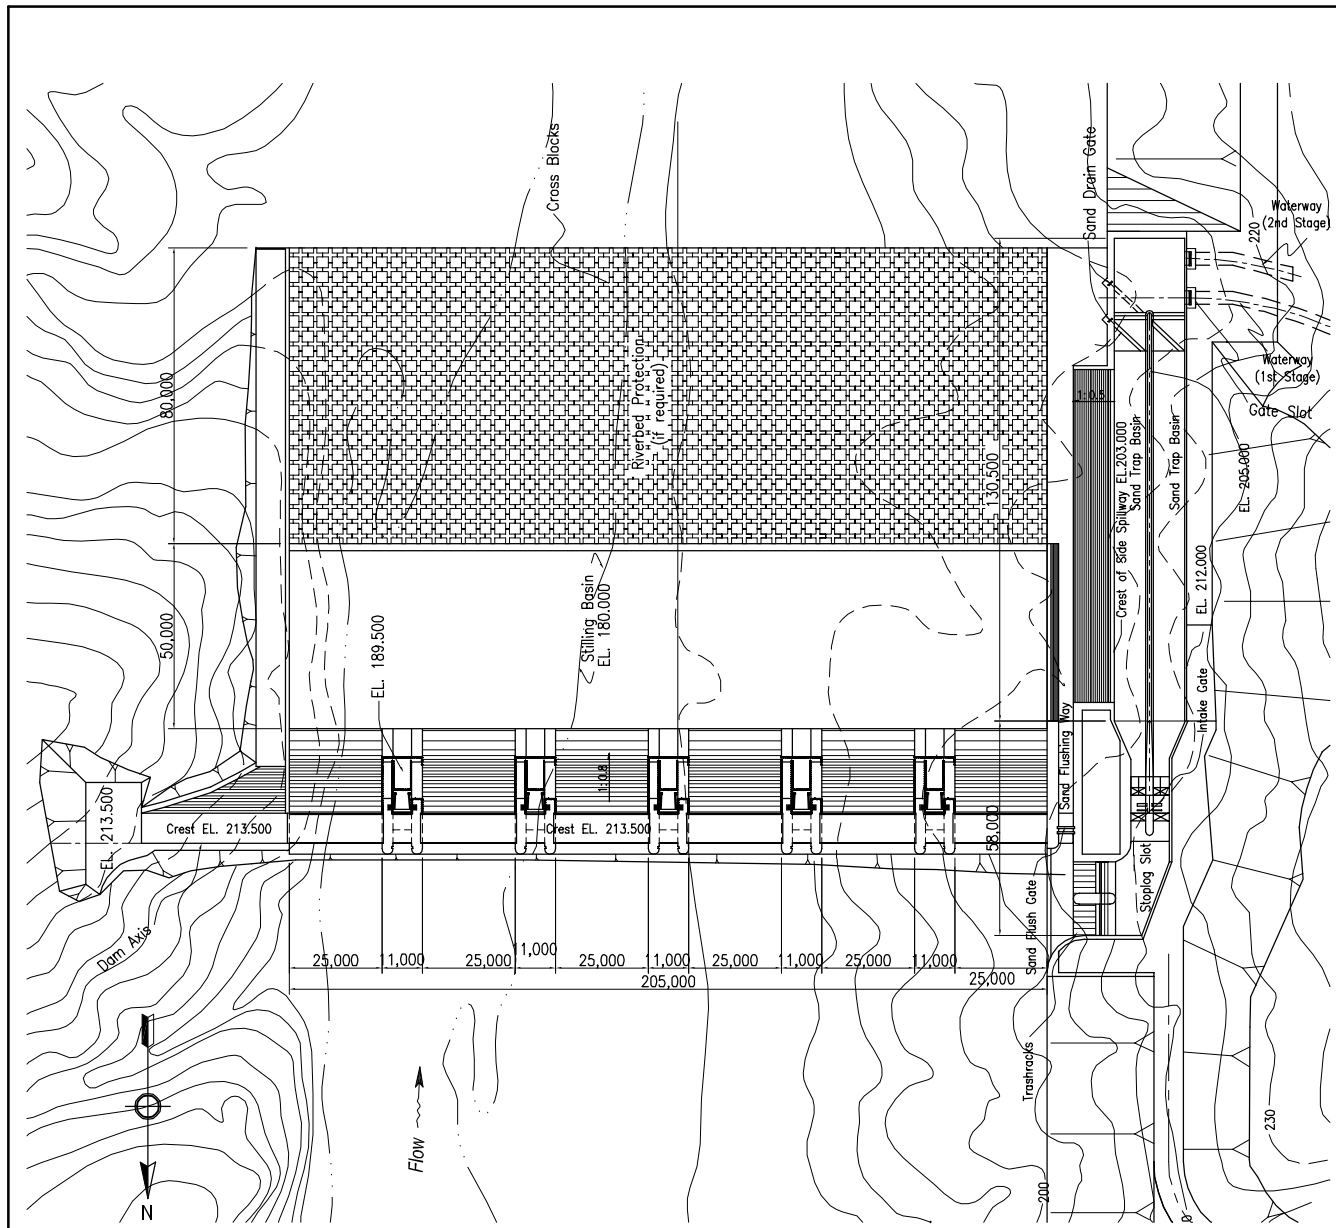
General Layout Plan and Typical Section of Laiban Low Dam
